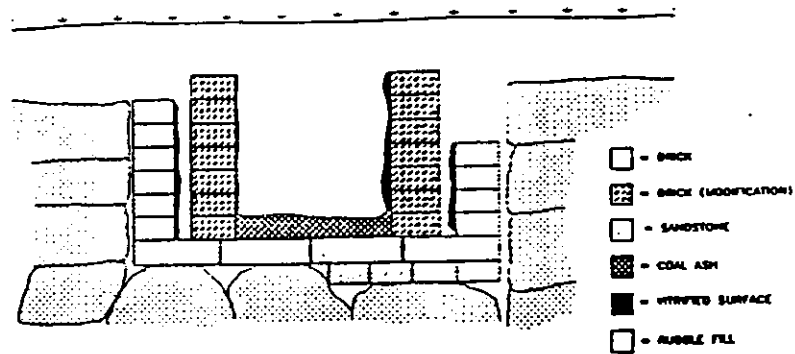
Section through fire box of Kiln 1 and 2, Tile Works Site (11-Gr-70).
